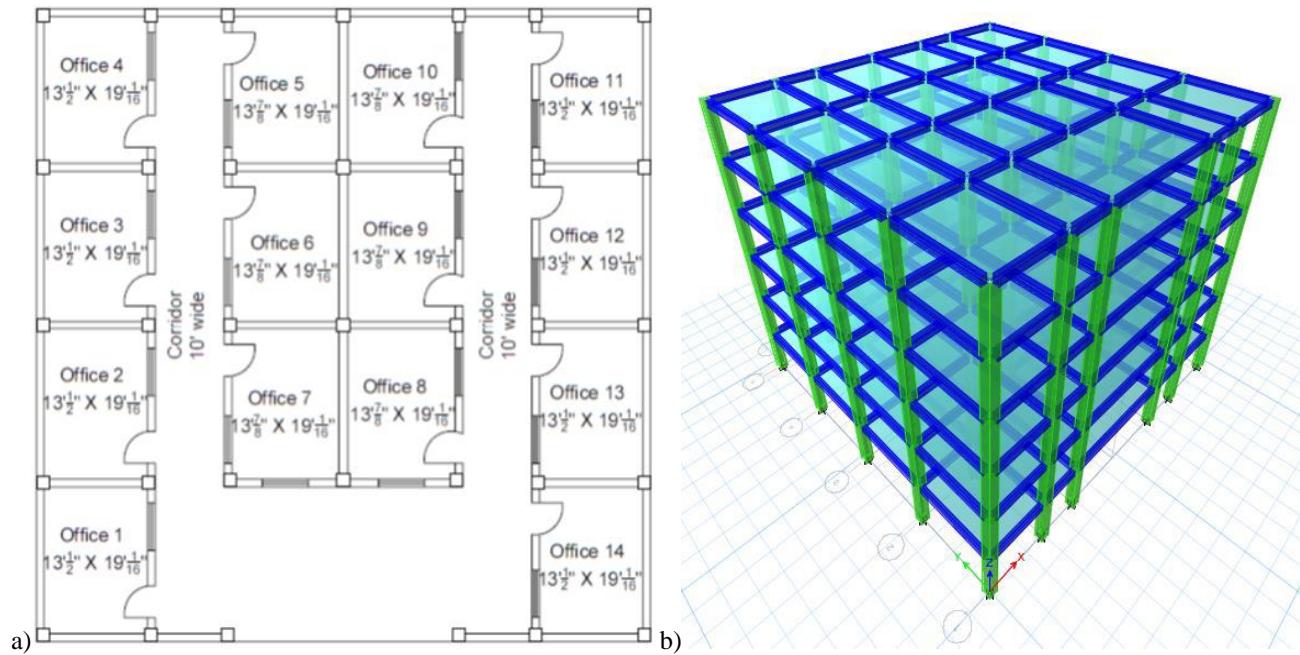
(a) Plan of Given Building, (b) Extruded BF 3D view of Building
